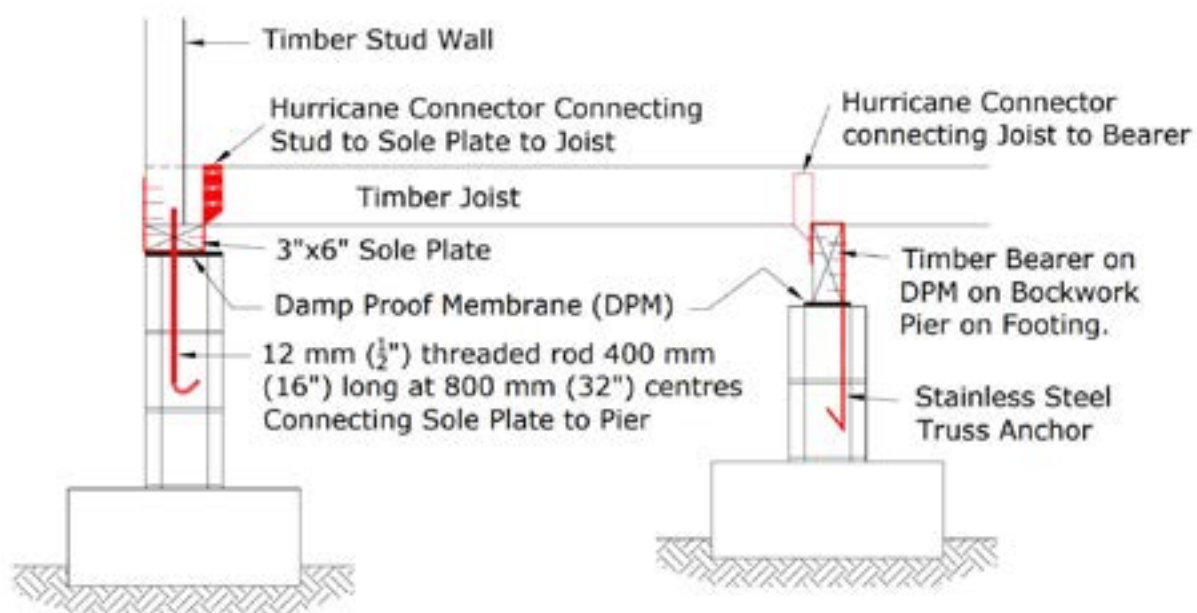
TIMBER BEARER ON MASONRY PLINTH
